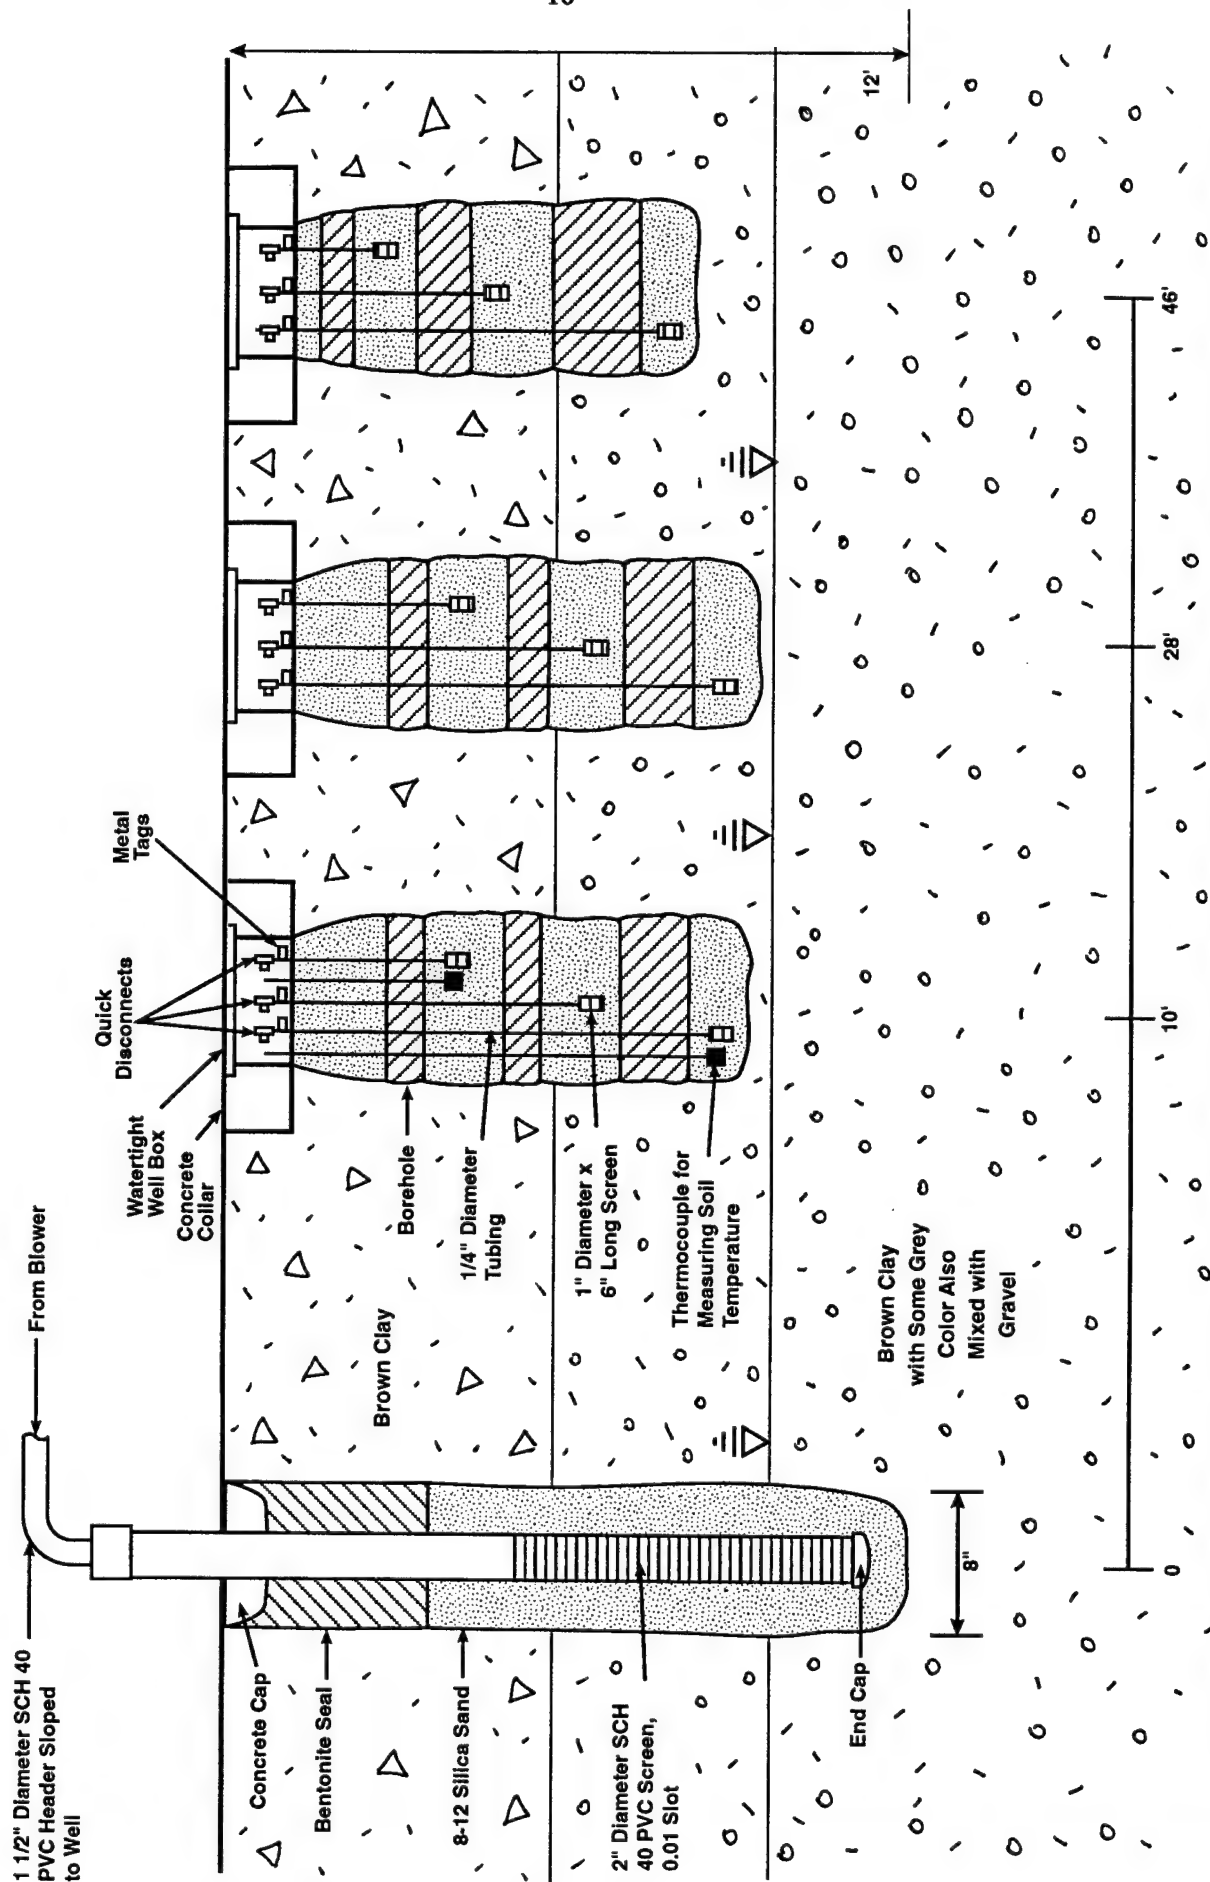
Cross Section of Vent Well and Monitoring Points at Facility 27 Showing Site Lithology and Construction Detail
